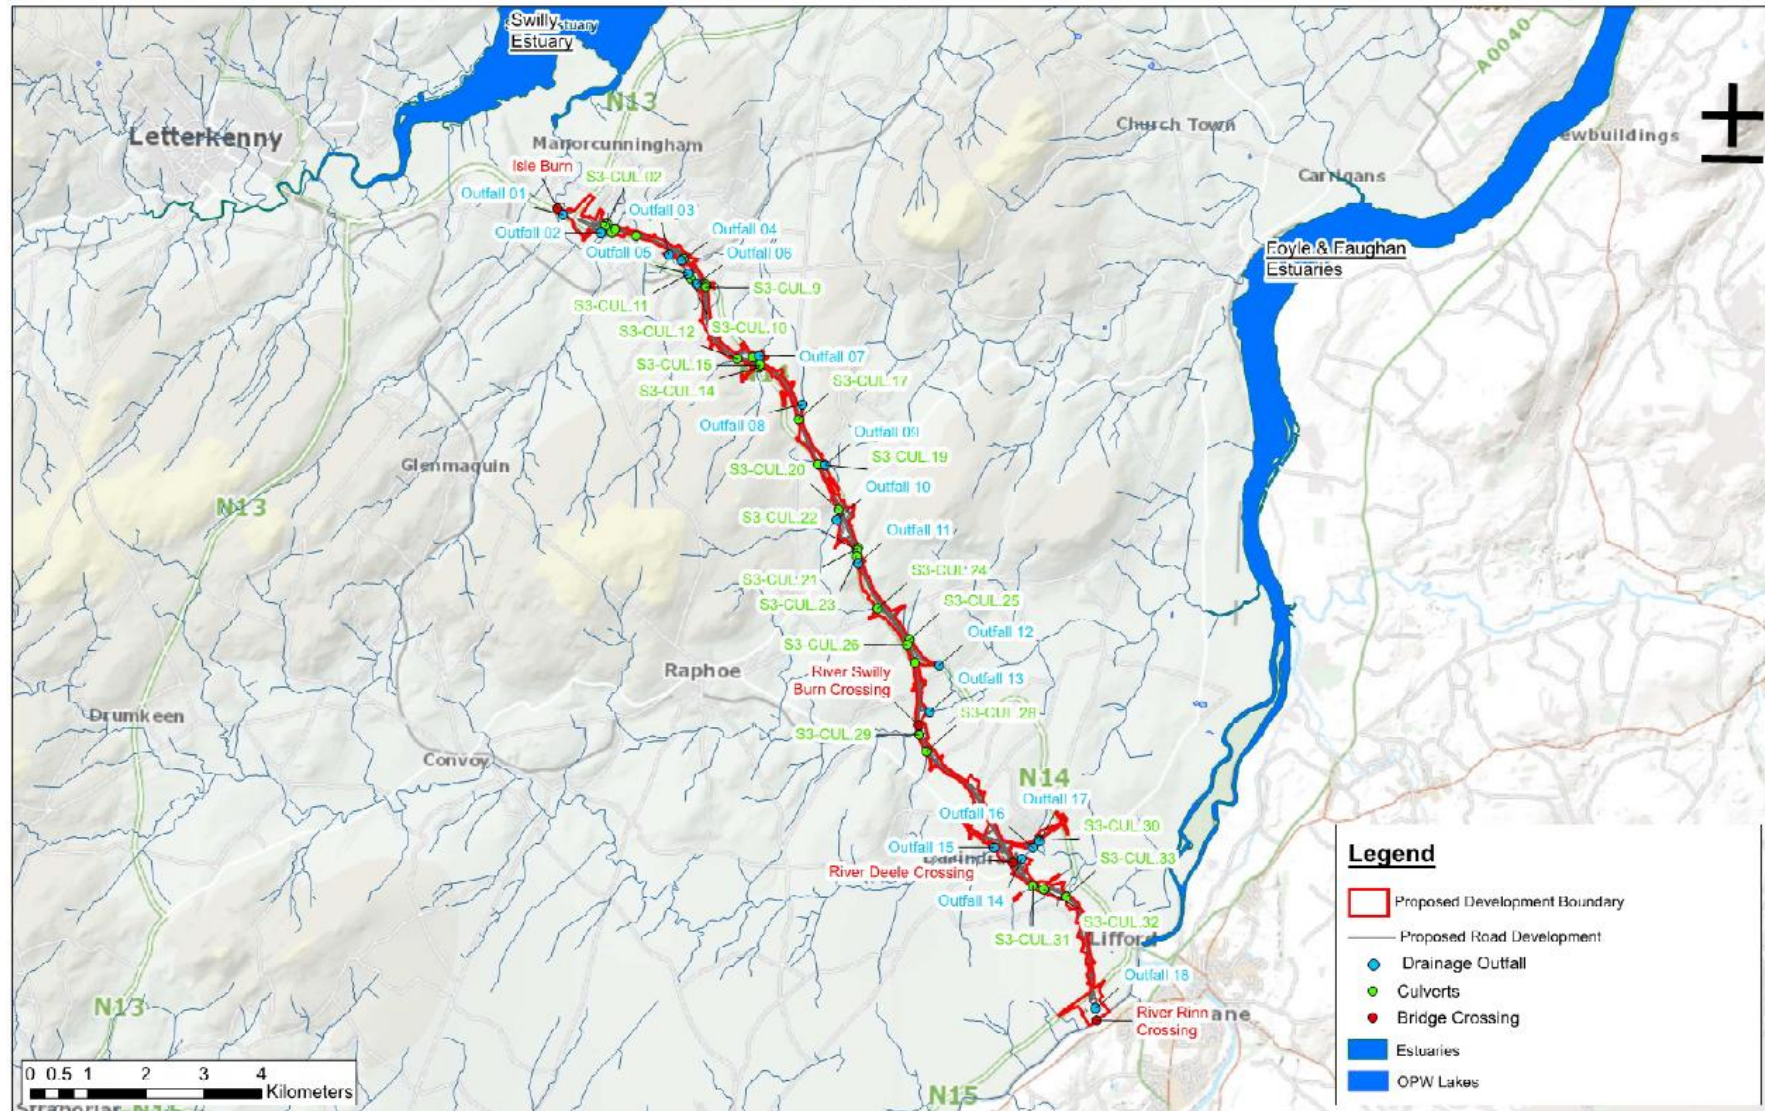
Section 3 Locations of Culverts, Bridges and Proposed Stormwater Outfalls
